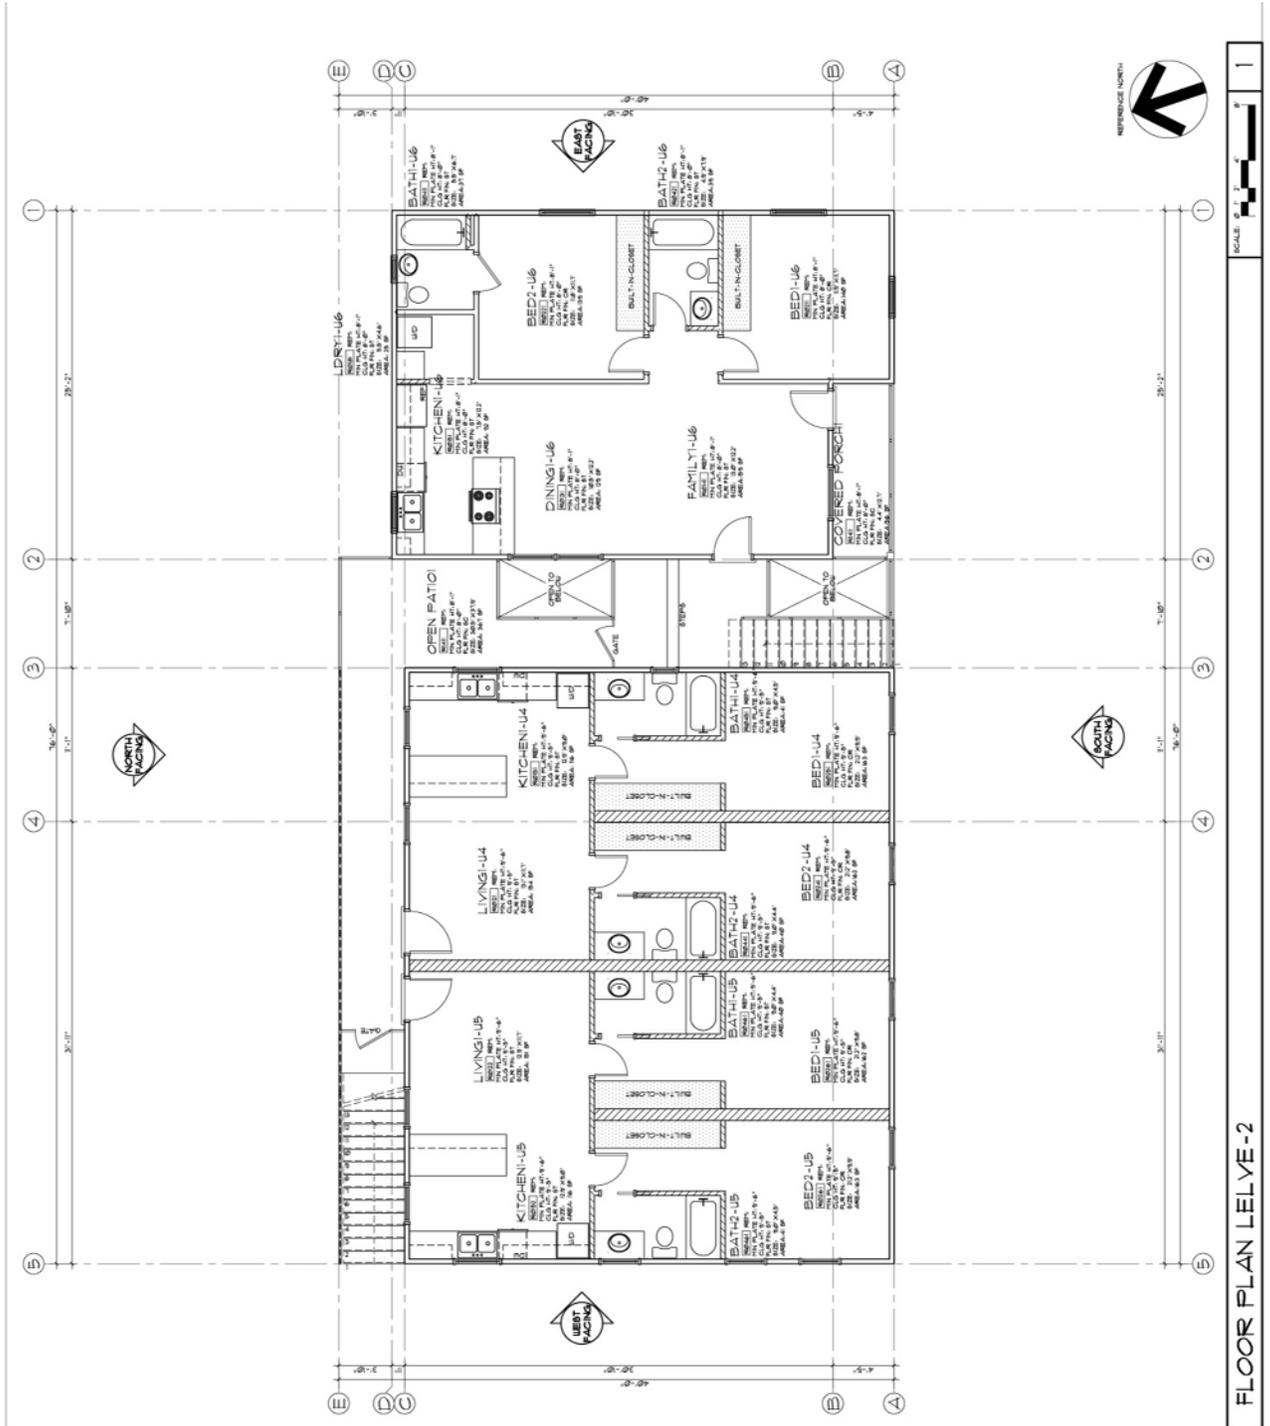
Exhibit C – Proposed Floor plan 2<sup>nd</sup> Floor
